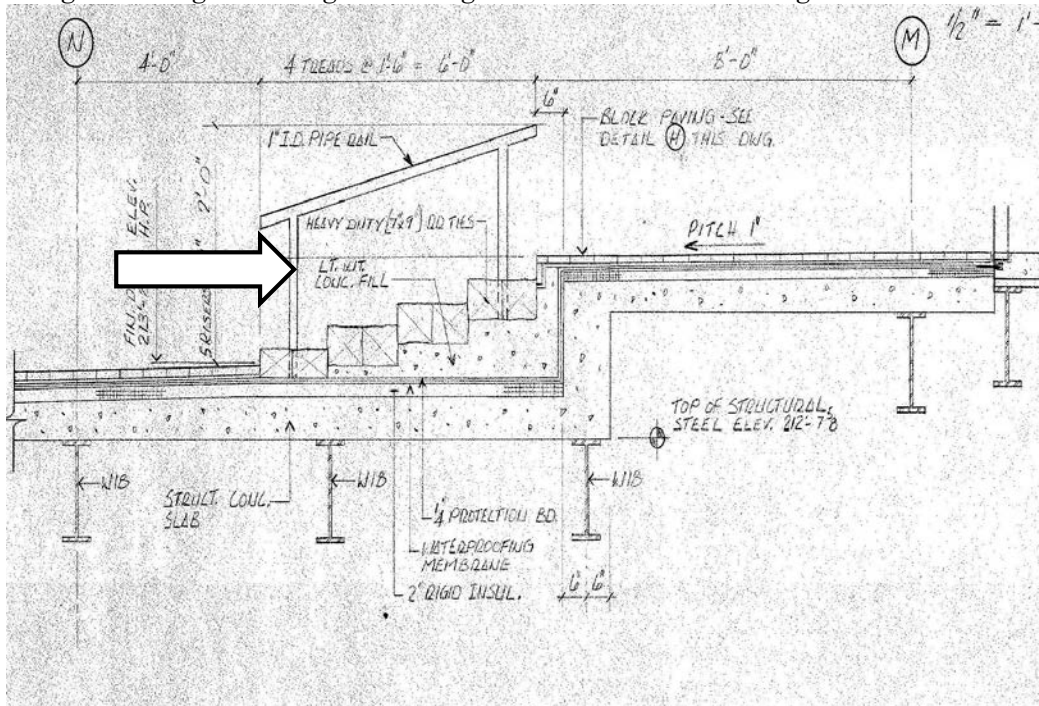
Image E – excerpt of the original building drawing, Section N, which references “Lt. Wt. Conc. Fill”.
